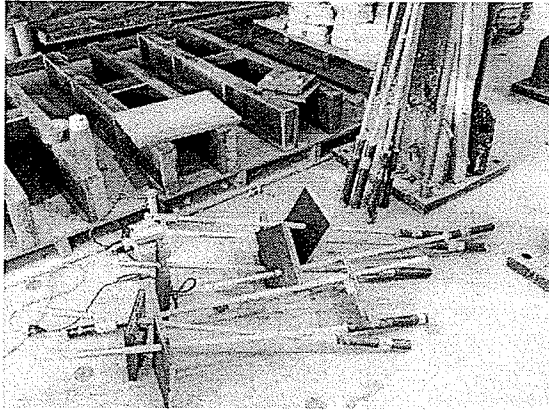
Detail of steel anchors and bond breakers in Series I
